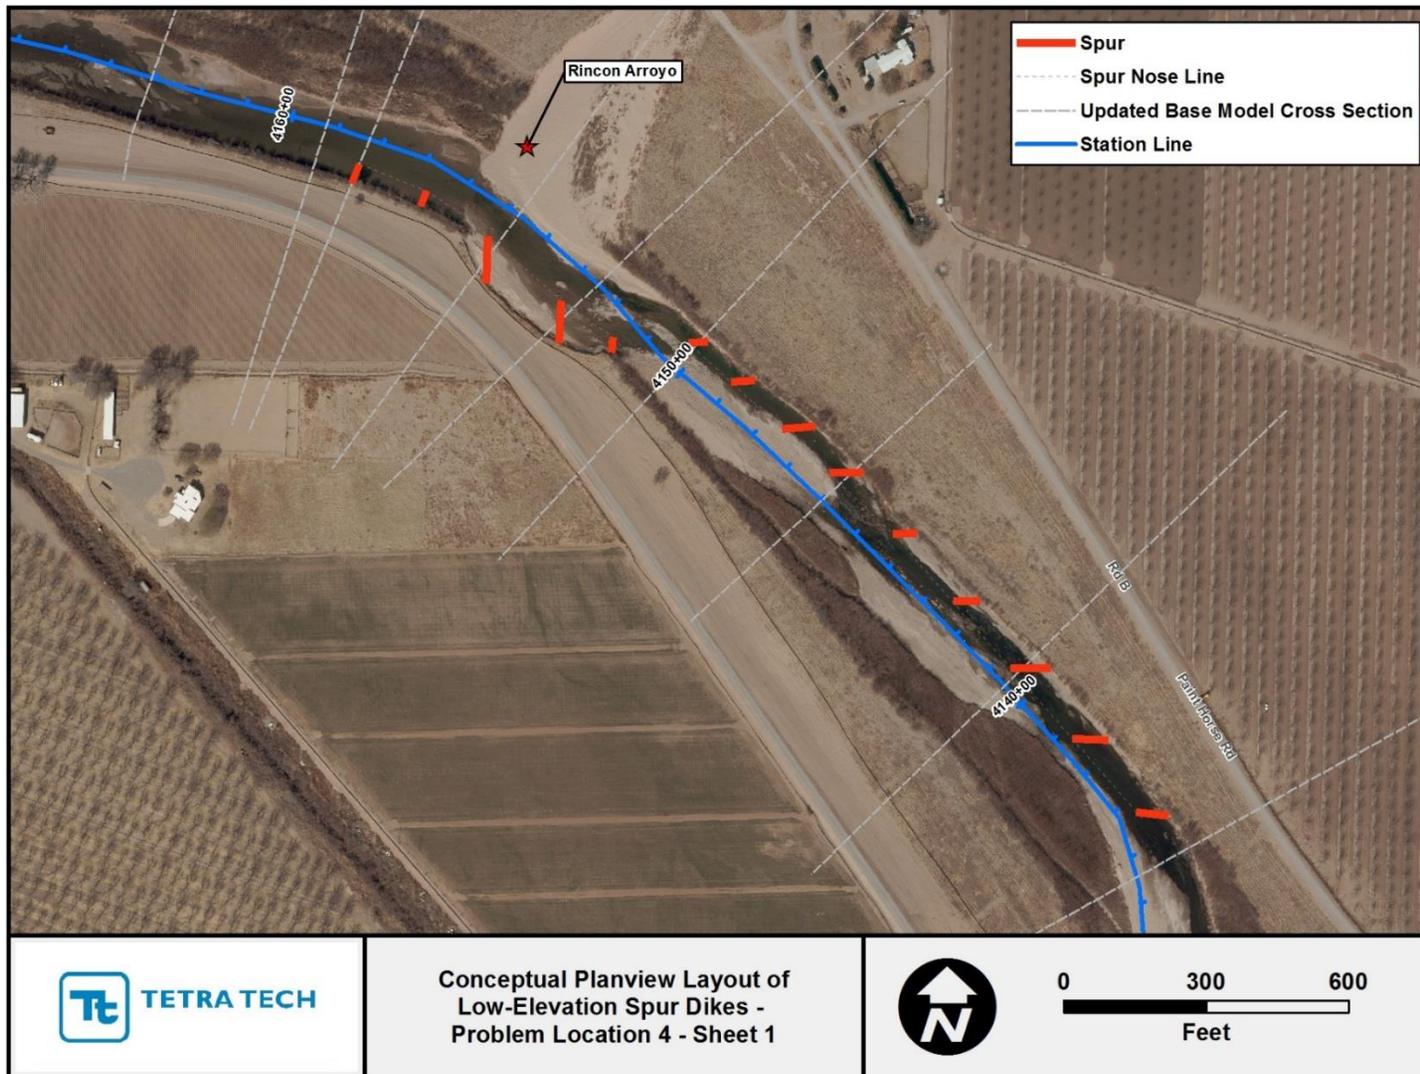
Conceptual layout of low-elevation spur dikes at Problem Location 4 (Sheet 1).
